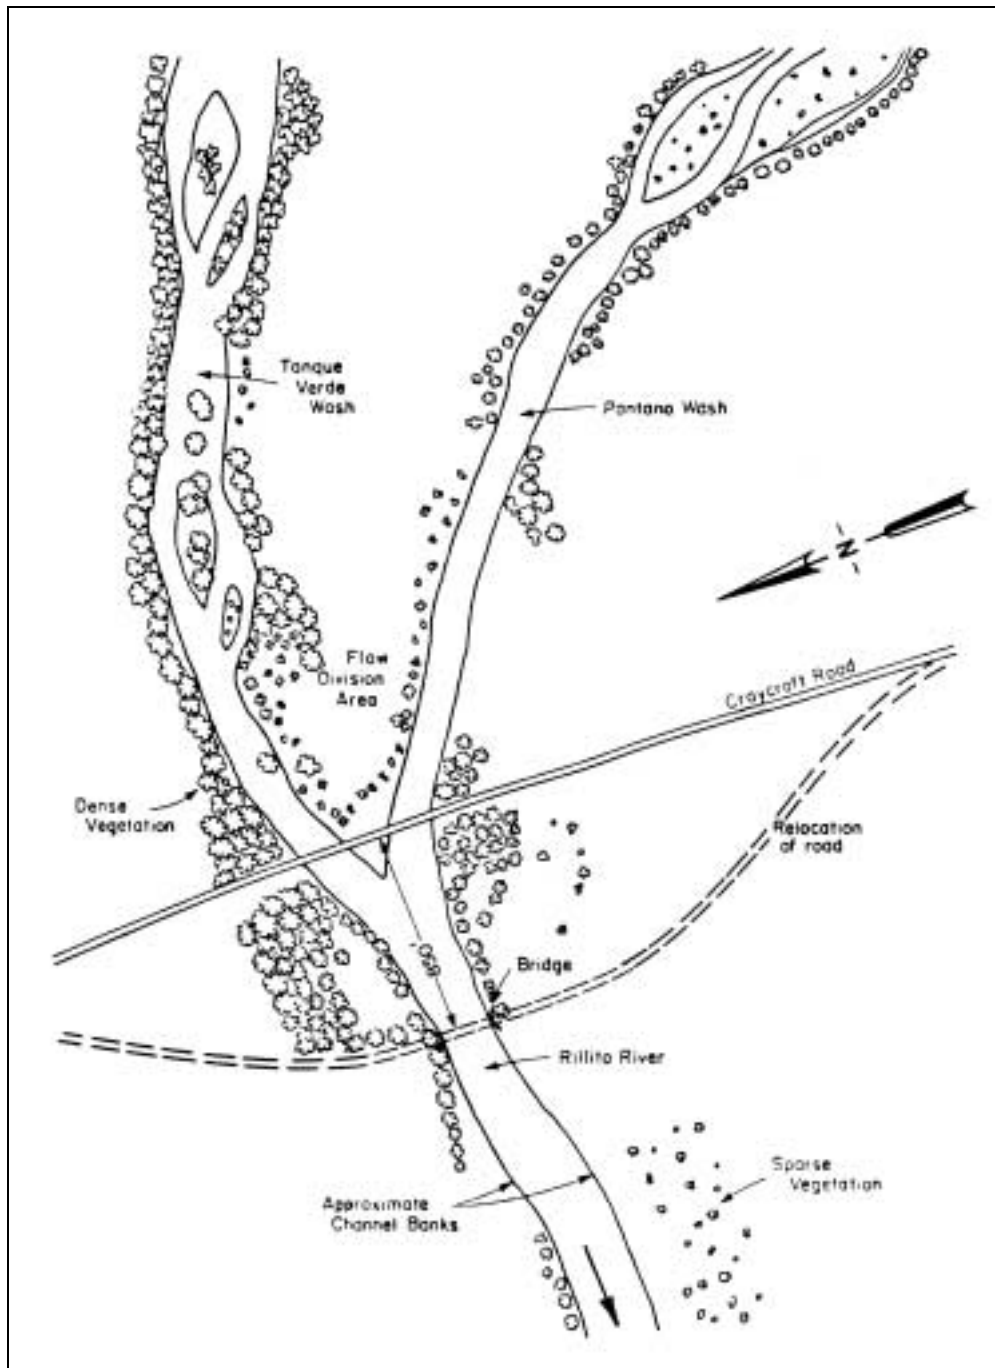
Alternative II for Craycroft Road Bridge crossing.
